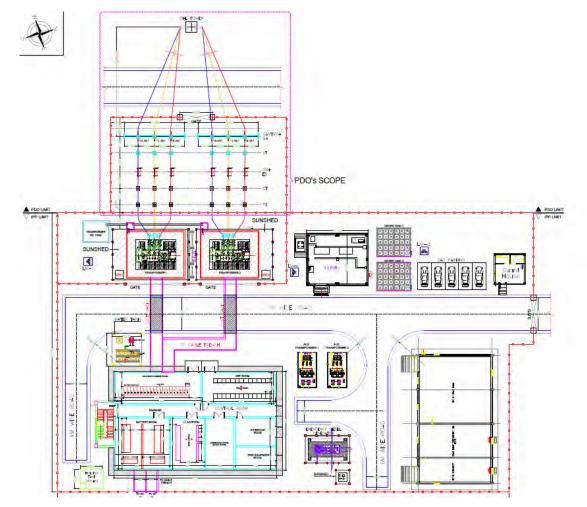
CONCEPTUAL LAYOUT DRAWING OF THE STEP-UP SUBSTATION
